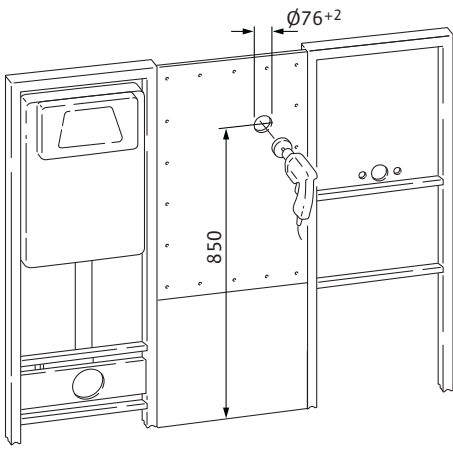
shows how to drill a hole 76 mm in diameter for installing the ventilation insert.
